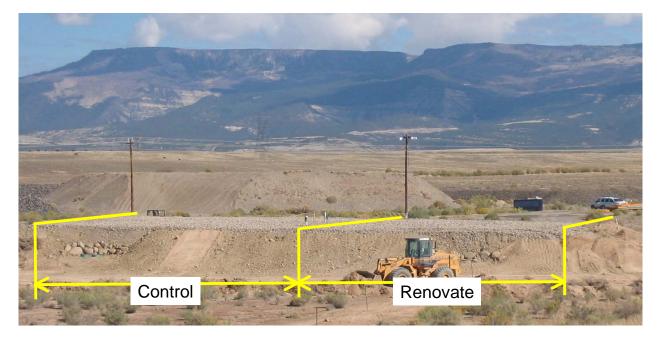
RECAP Lysimeter Test Facility under Construction at the Grand Junction, Colorado, Disposal Site.
